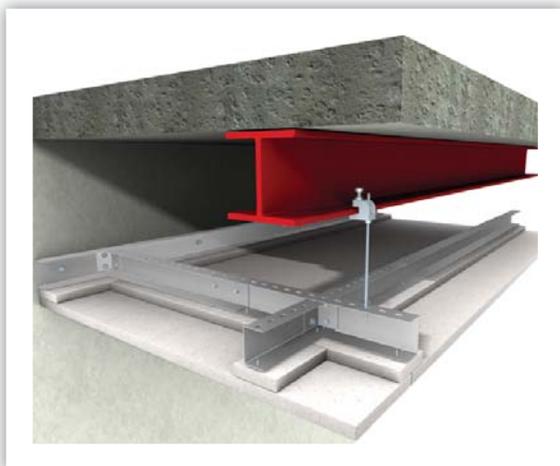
Examples of suspended protective membrane system for tunnel ceiling
